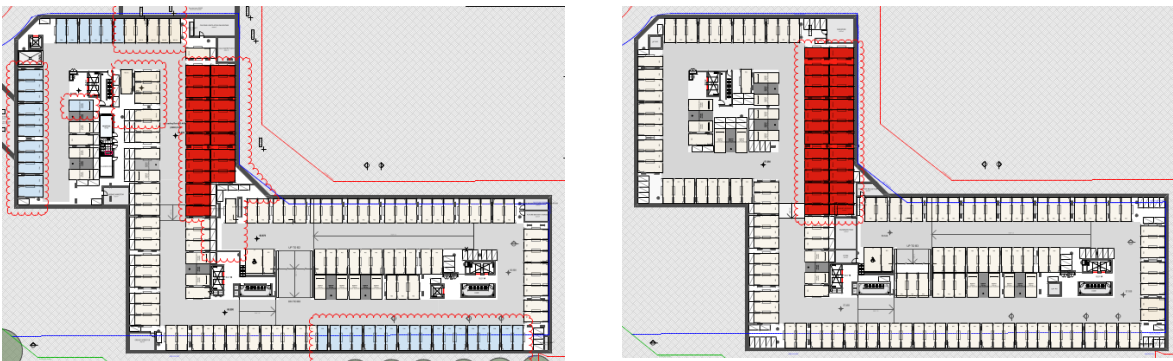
Proposed Morling College tandem parking arrangement (shaded in red).
